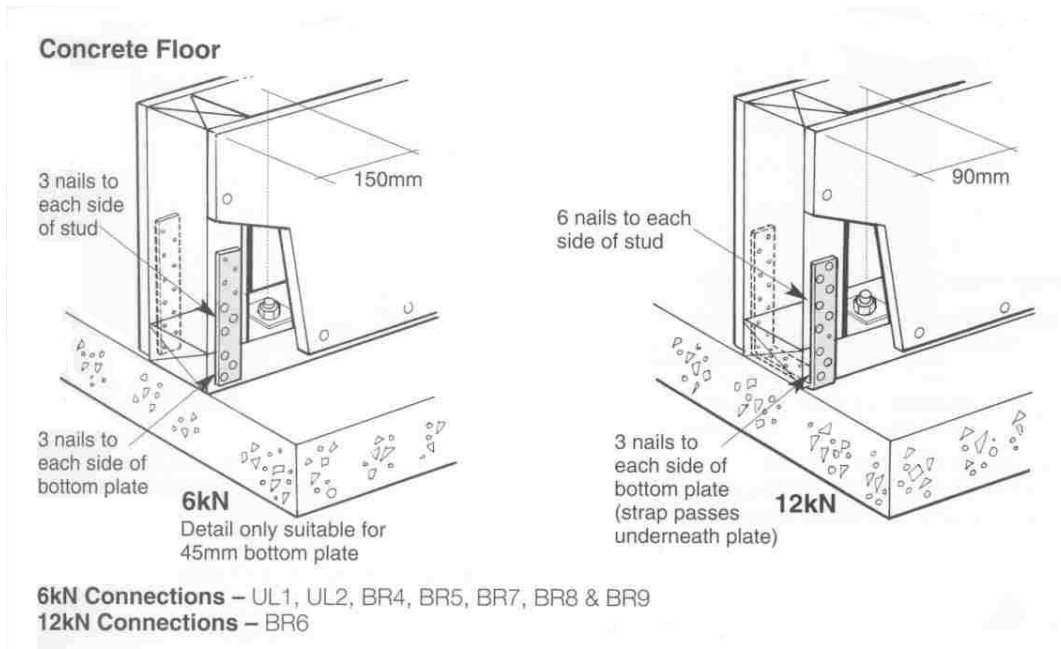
6 kN hold-down straps for bracing walls on a concrete foundation (printed with permission from Winstone Wallboards).
